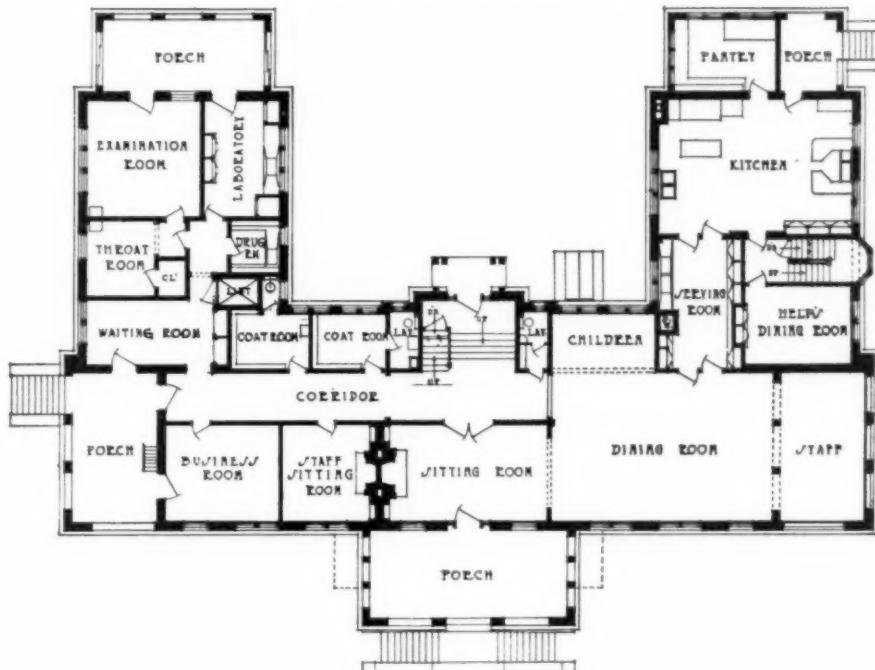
Nopeming Hospital for Tuberculosis. Administration building. First floor plan.
